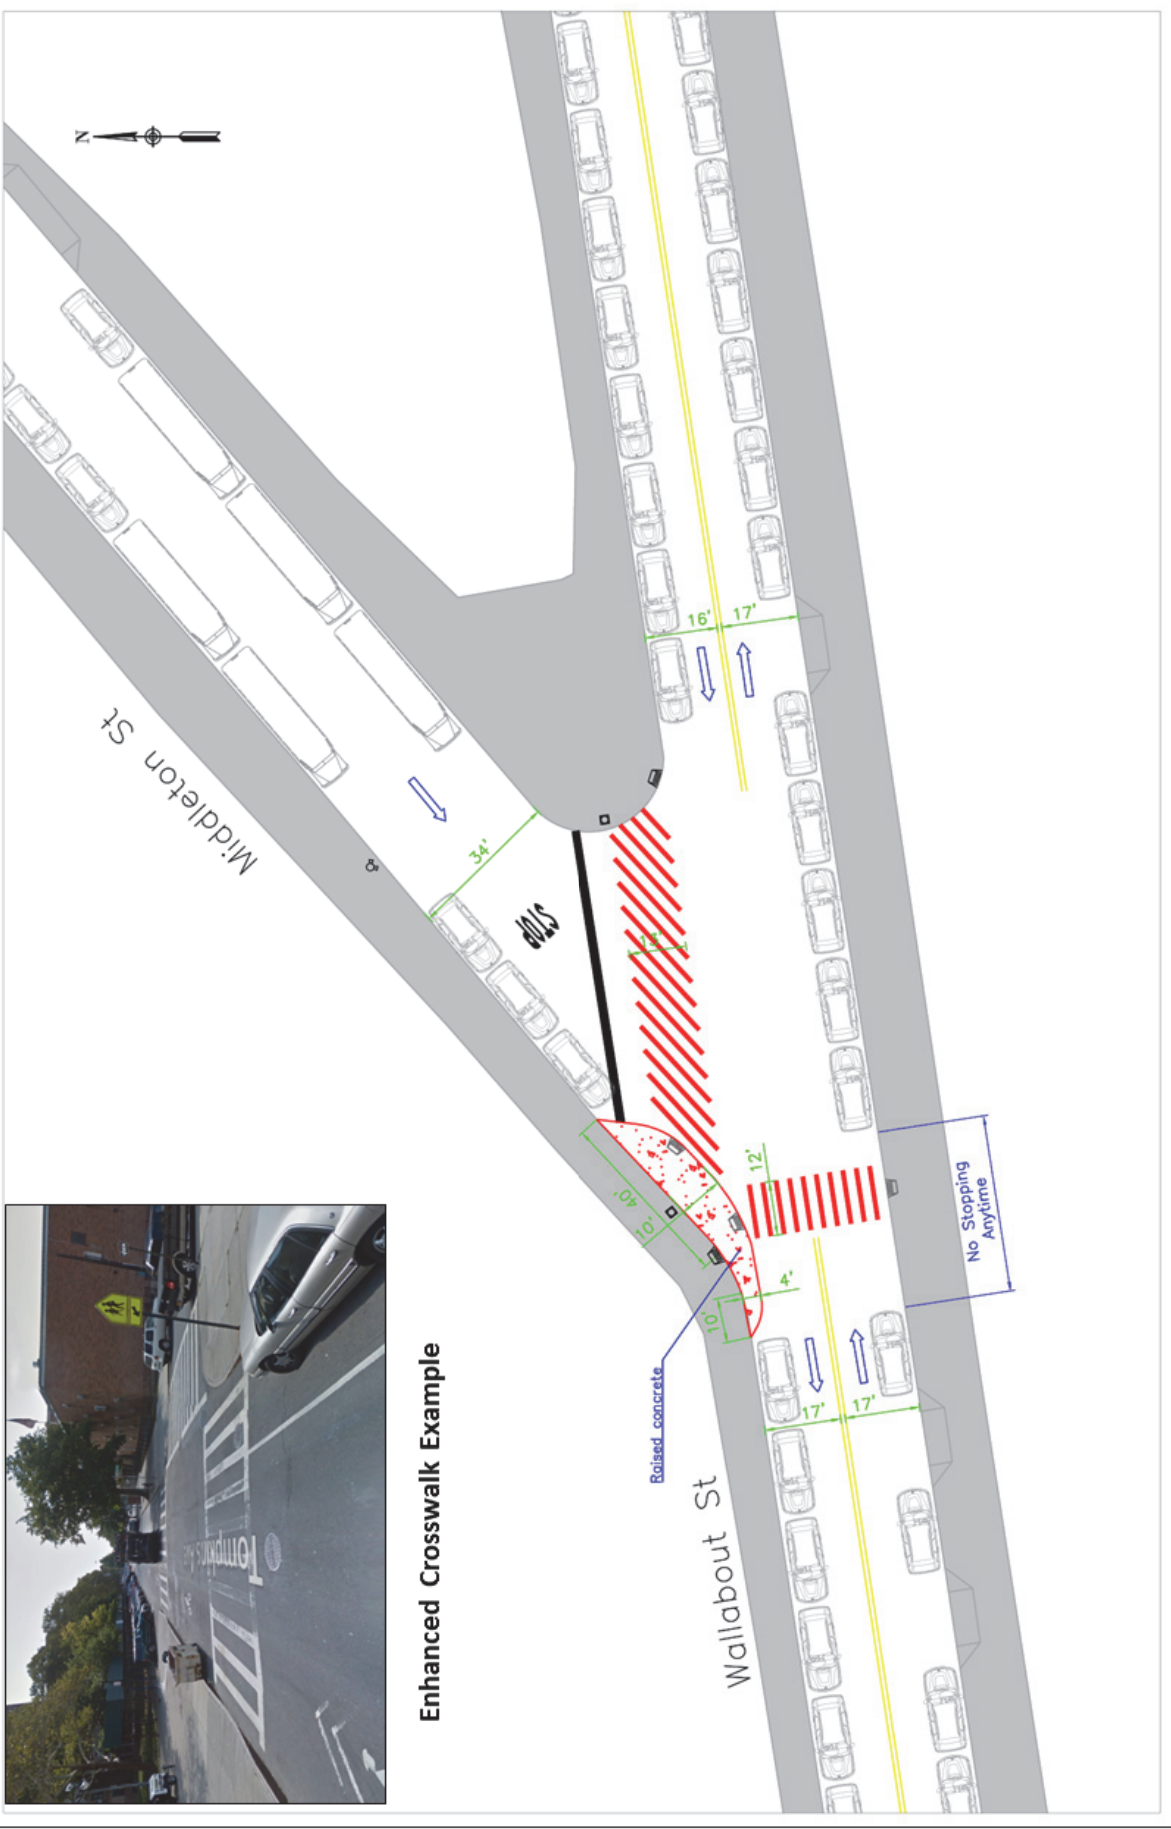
Wallabout Street and Middleton Street - Proposed
